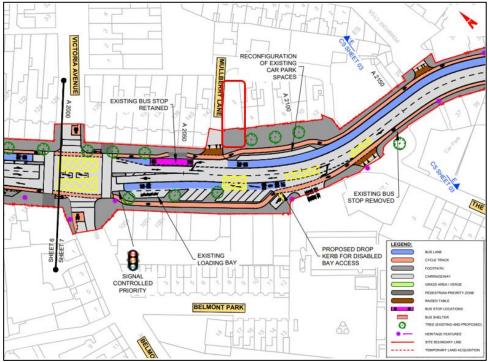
Extract from General Arrangement Drawings at No. 2 Donnybrook Road (Sheet 07)
